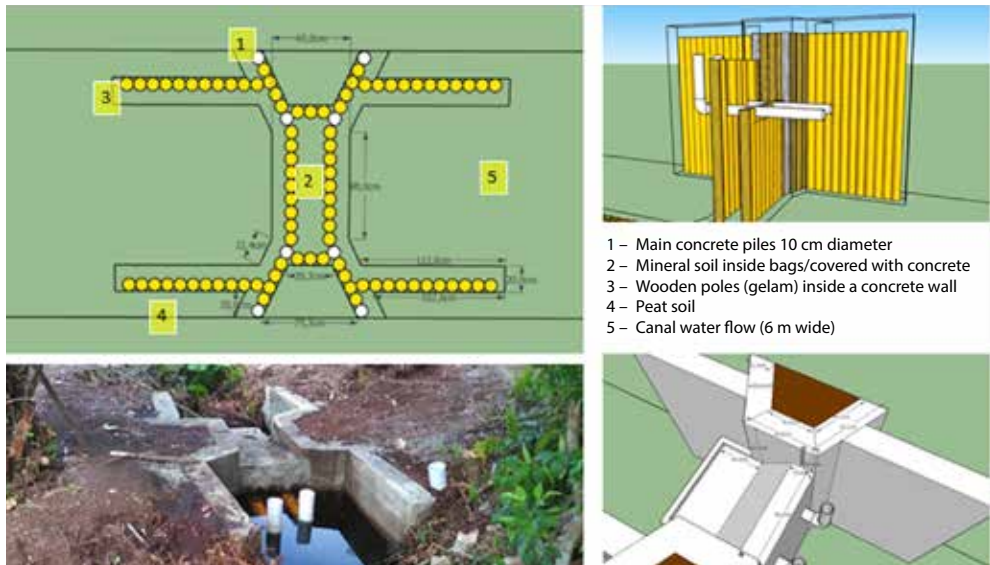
Alternative canal block design with a ‘morning glory’ spillway
